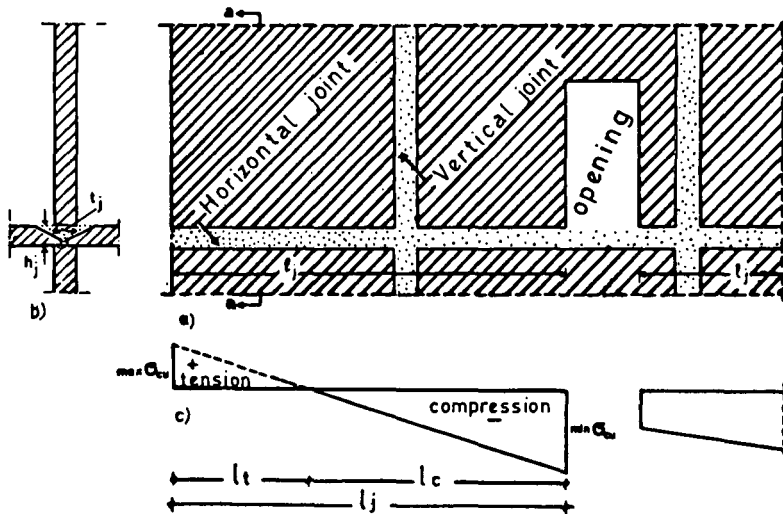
Sketch in which geometrical or reinforcement details are not shown
